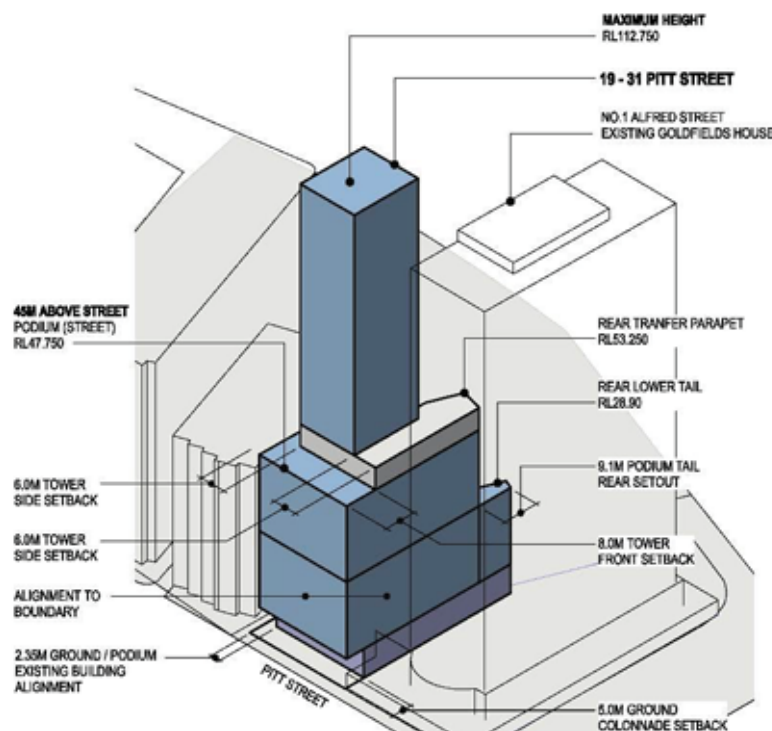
Approved Stage 1 envelope for Fairfax House (Source: Mark Hurcum Design Practice Architects)
